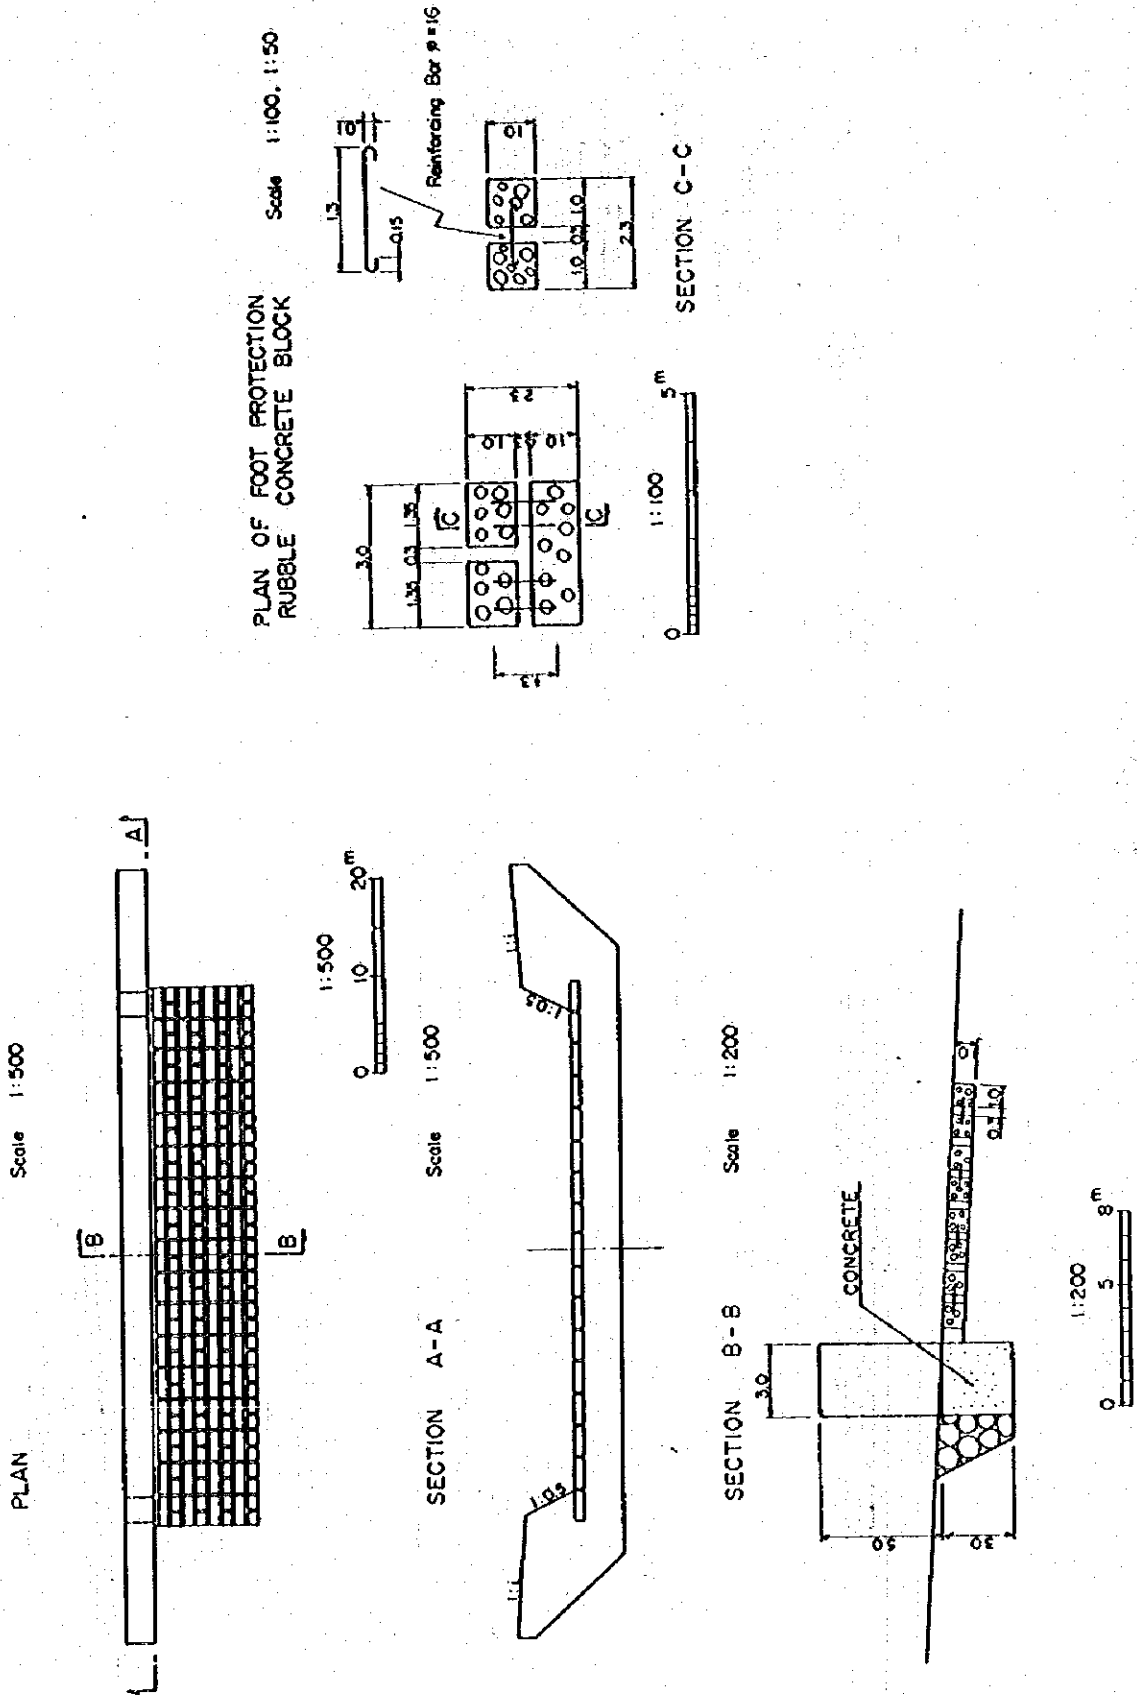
TYPICAL DESIGN OF GROUND SILL (TYPE B)
